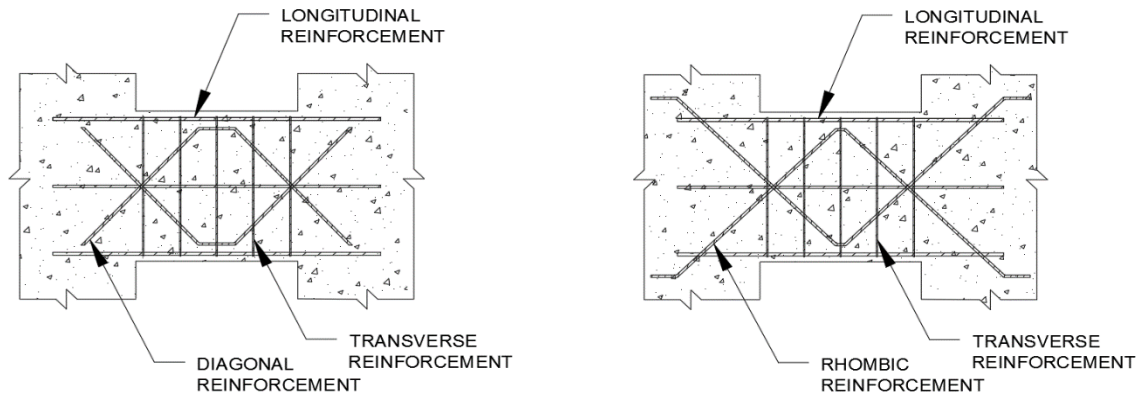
Bent-up bar (left) and rhombic reinforcement (right) at beam-wall interface (wall reinforcement omitted for clarity)
